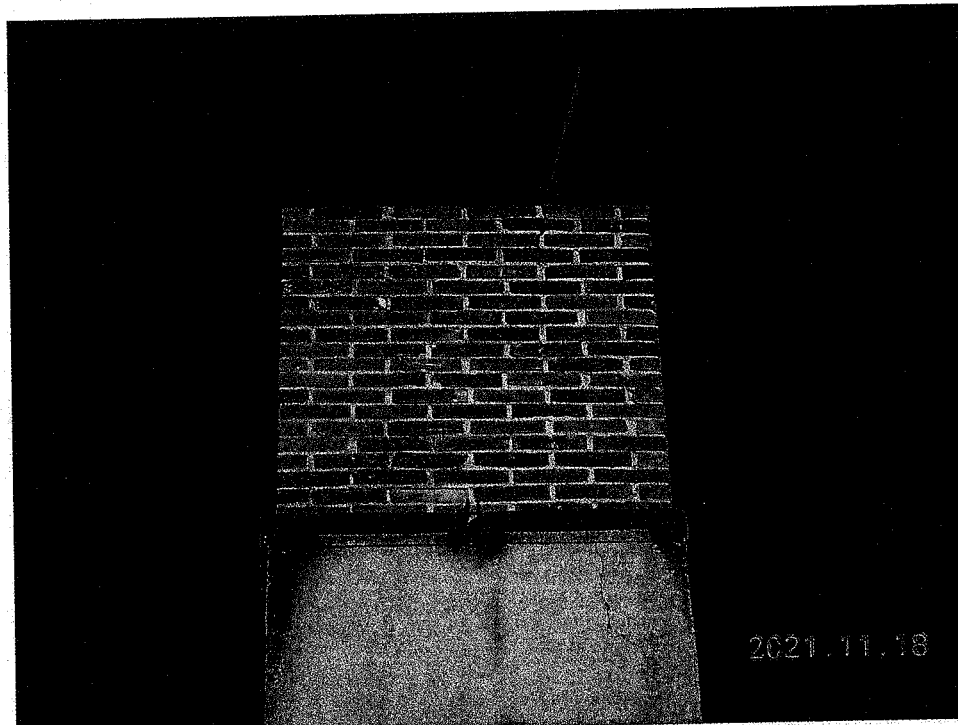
Routine Repair 30 – Cracking of mortar joints on brick masonry chimney – Roof, Grid D.5-E/5
